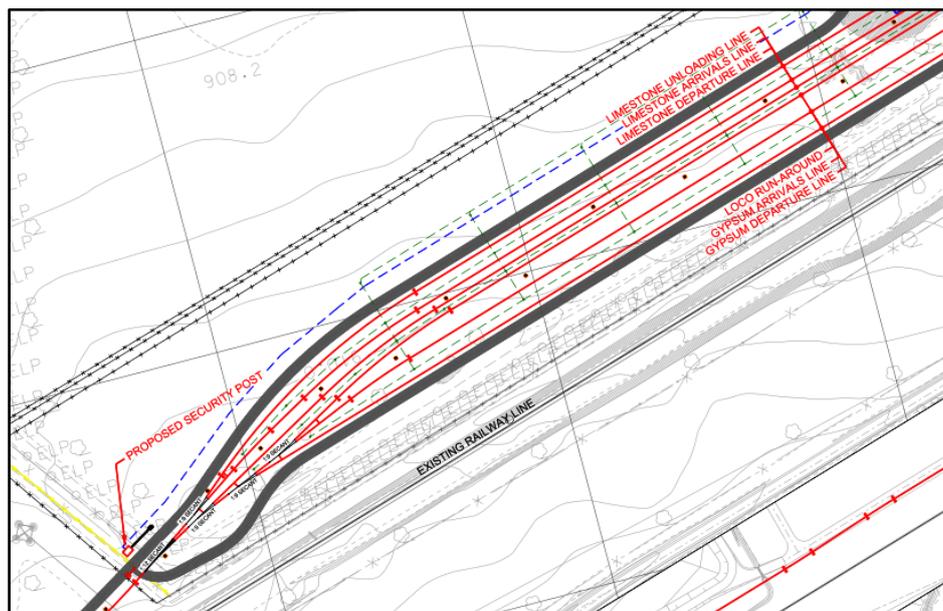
Proposed alignment and layout of the rail infrastructure
